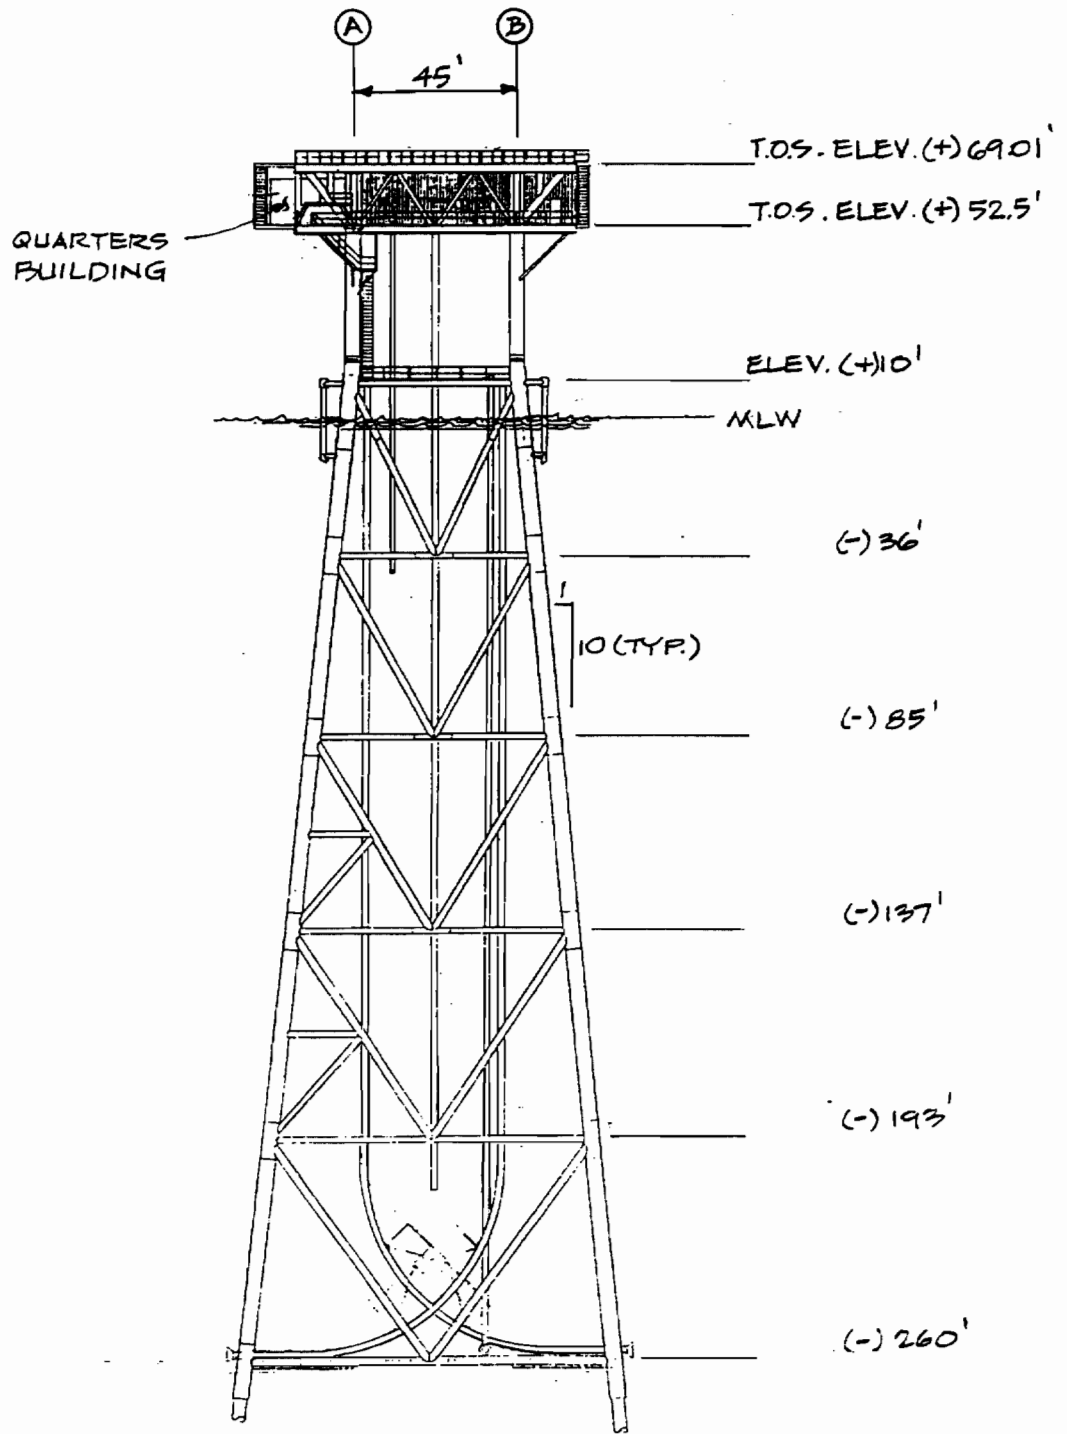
ENDON ELEVATION - ROW 2 and 3
